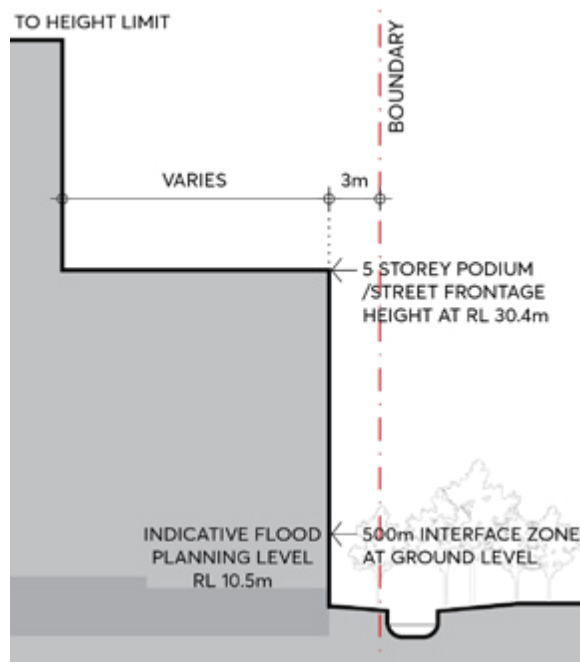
Jubilee Park (West) Street Wall
